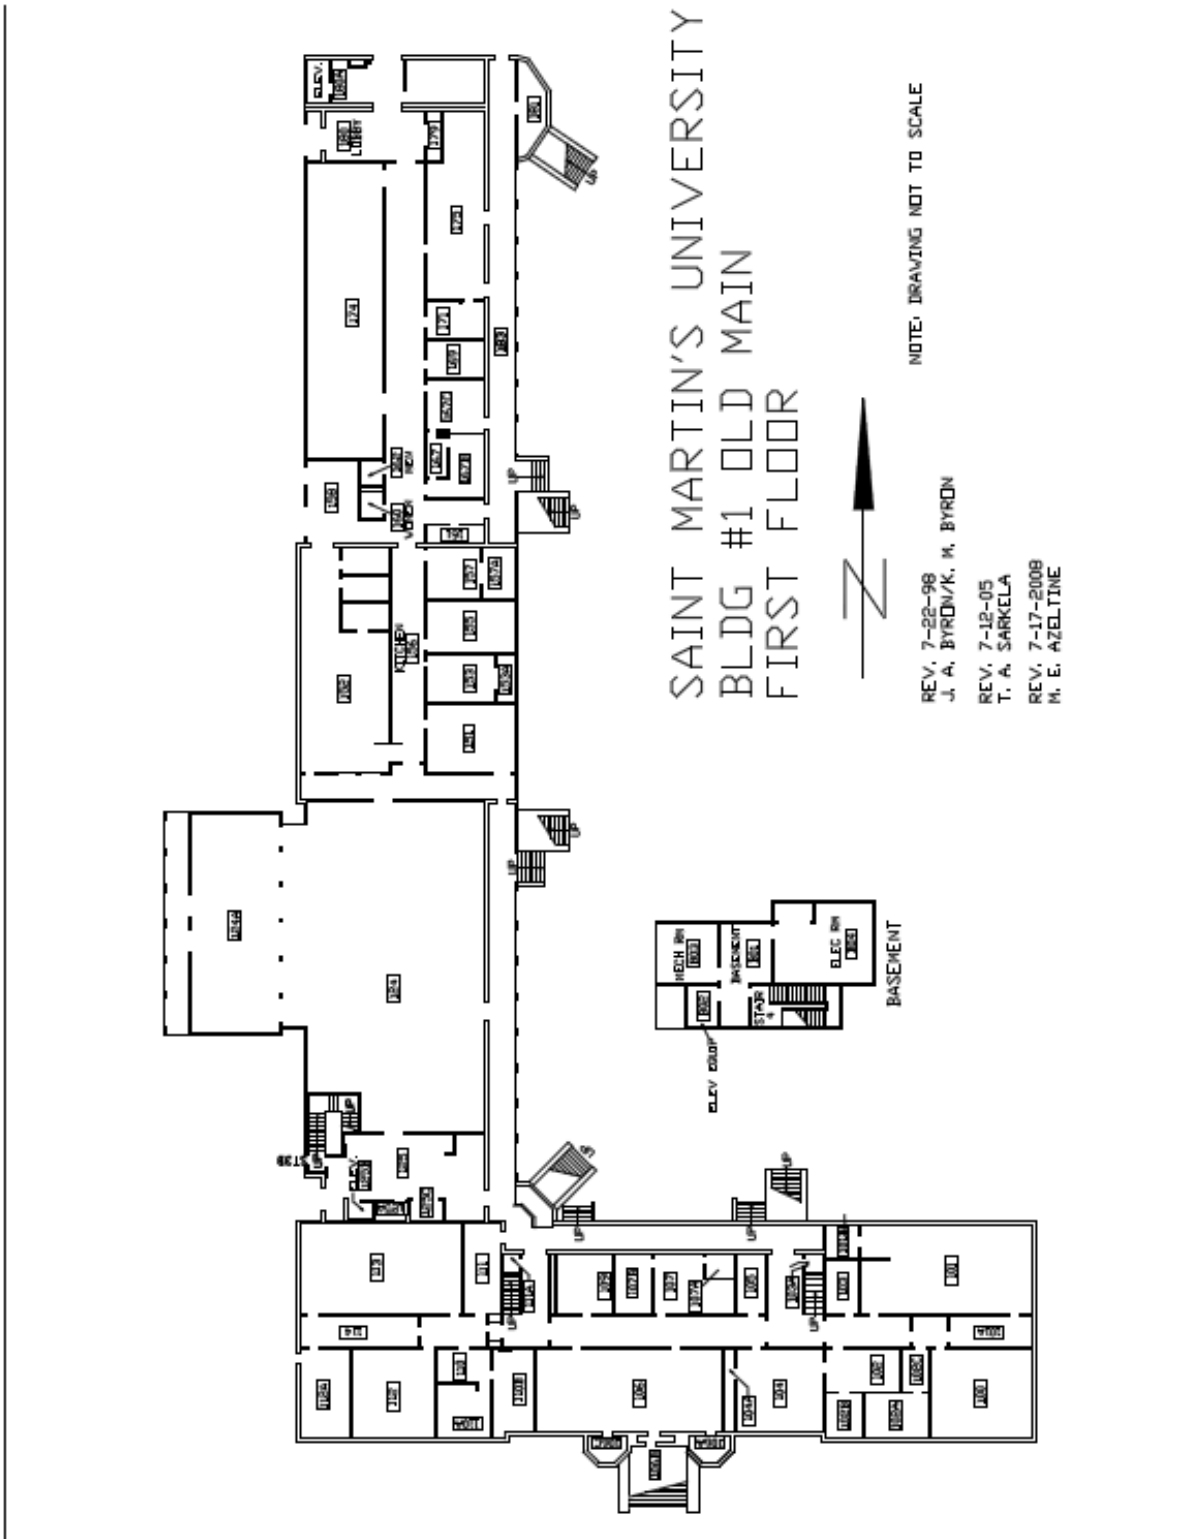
Saint Martin's College – Floor Plan – 1st floor
